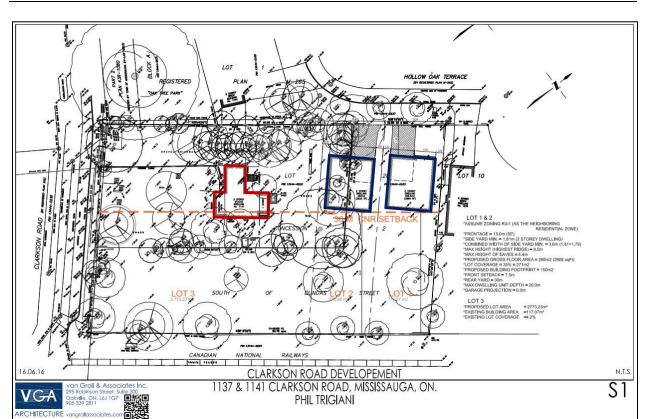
Proposed development at 1137 & 1141 Clarkson Road North. Heritage building outlined in red, proposed residential buildings outlined in blue. (VGA Architecture, annotated by ASI)
